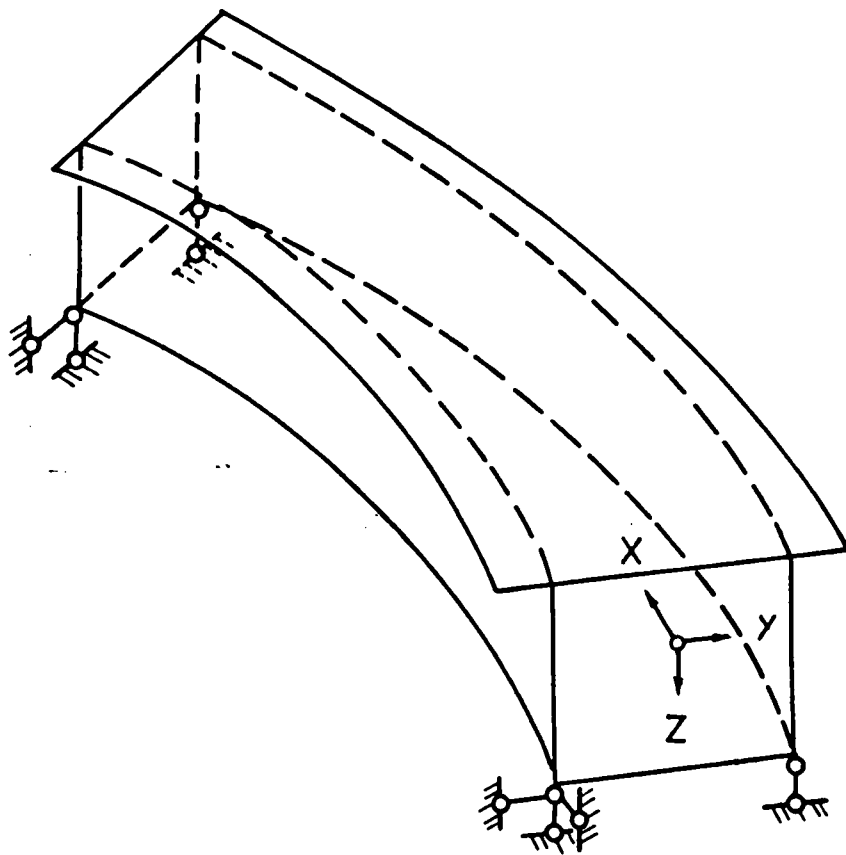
Horizontally Curved Box Girder Bridge
